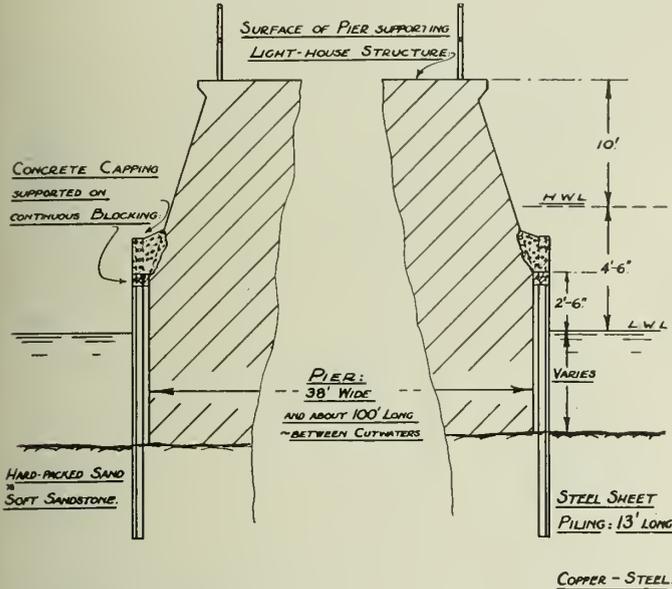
Reconstruction of Pier Sub-structure, Sandy Beach Lighthouse.
